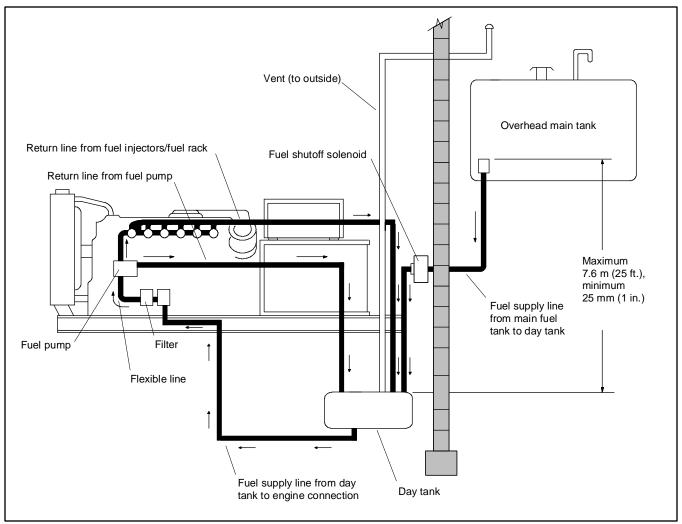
Diesel Fuel System with Overhead Main Tank and Day Tank
